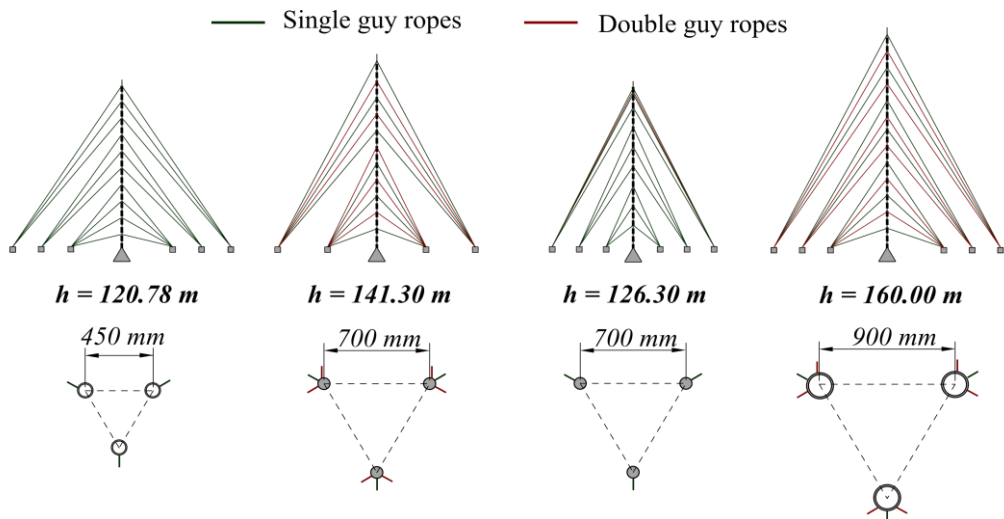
Schematic layout and cross-sections of the considered mast structures
